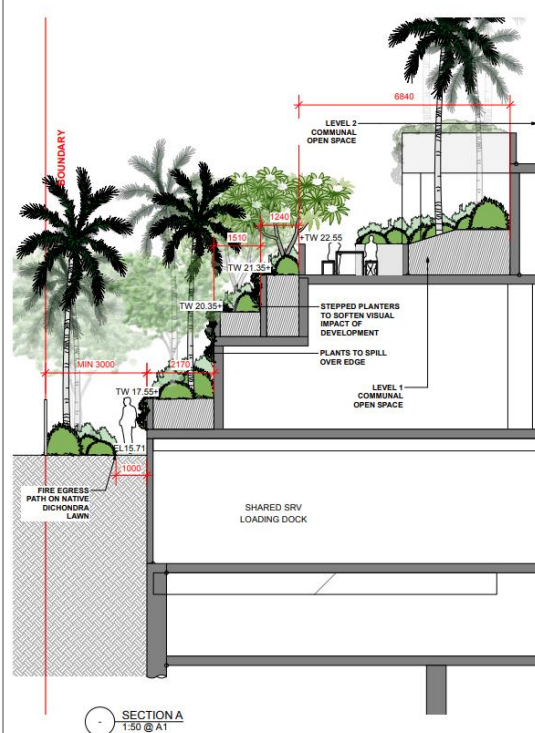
Proposed planting along northern elevation. (Source: SiteDesign +Studios)
